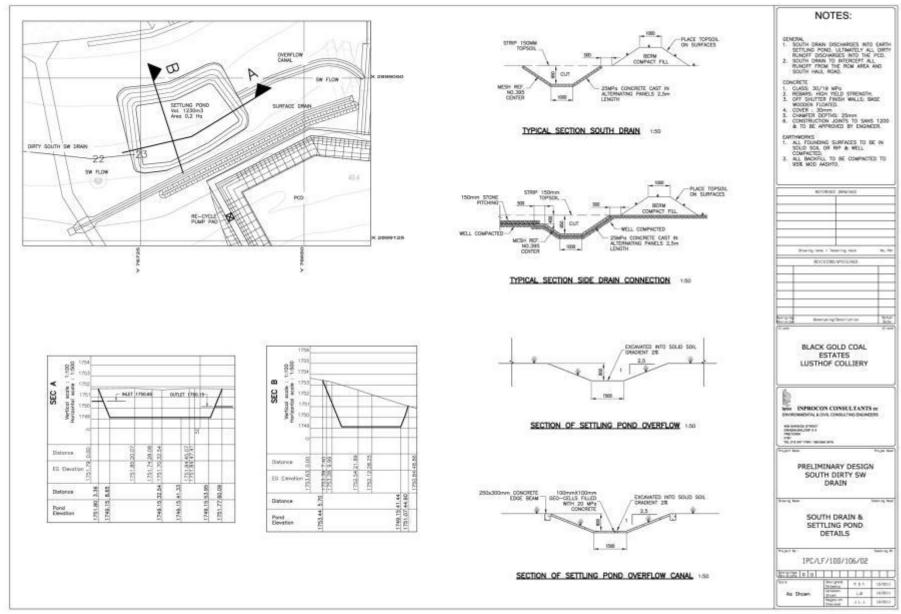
(a): Southern Dirty Water Interception Drain – General Layout and Long Section.
